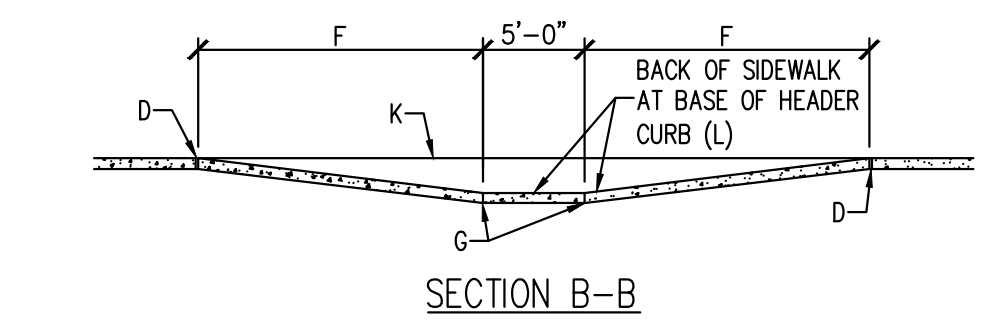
DETAIL B ADEQUATE R.O.W. FOR SETBACK SIDEWALK ADJACENT TO P PERPENDICULAR RAMP
